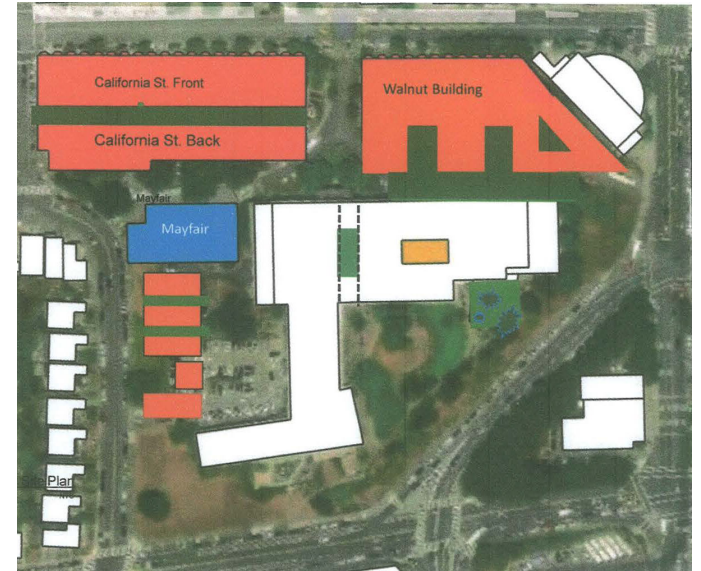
ALTERNATIVE D: PARTIAL PRESERVATION - OFFICE ALTERNATIVE SITE PLAN
